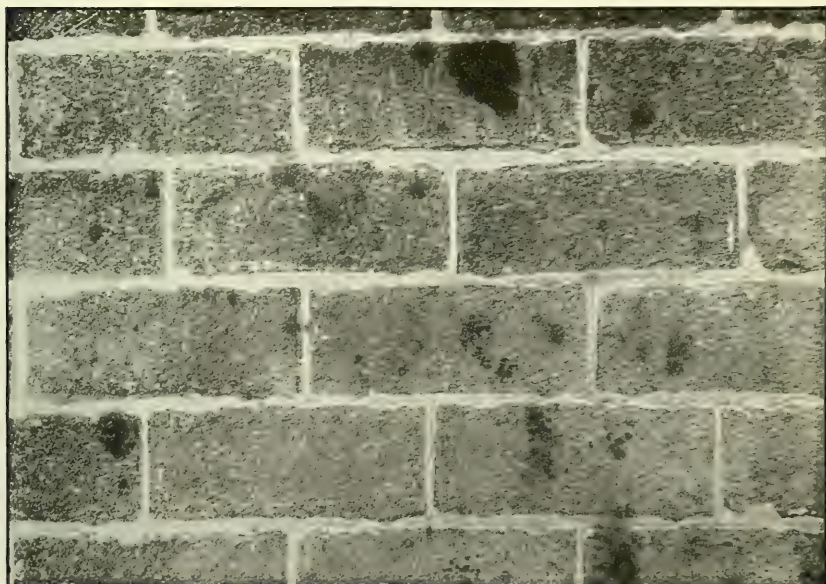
SHOWING PROPERLY FILLED GROUT JOINTS.
